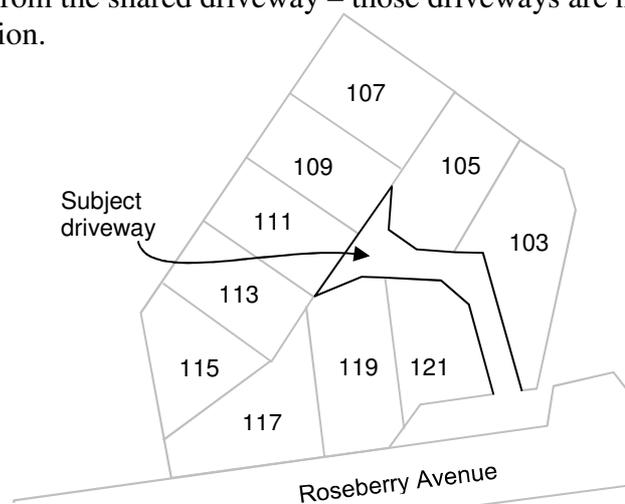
Site plan of the Roseberry Avenue properties (not to scale)
